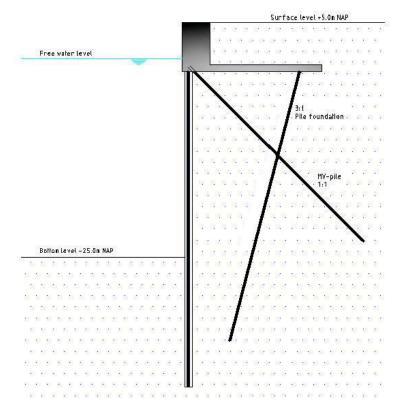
Phase - 4: Front excavation and fill of the back side
